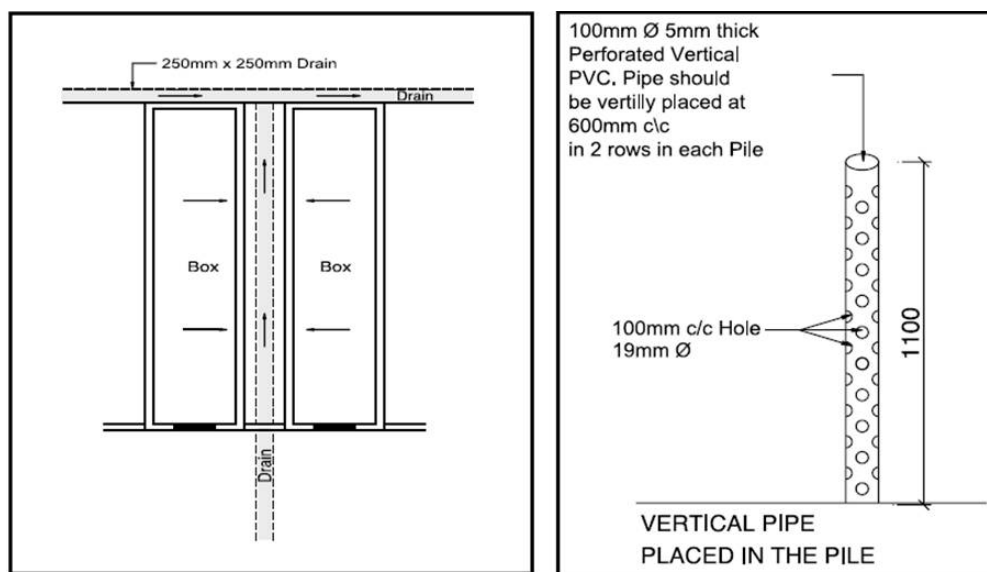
Cross section of drainage channels and vertical pipes²⁶
